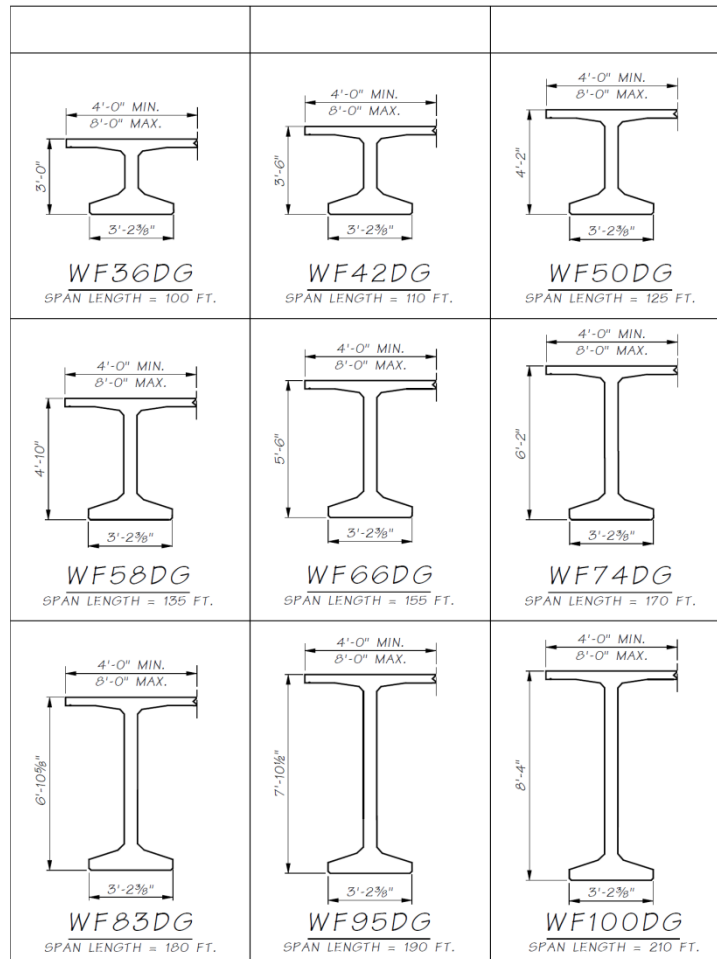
WSDOT Pretensioned Wide Flange Deck Bulb Tee Girders.
